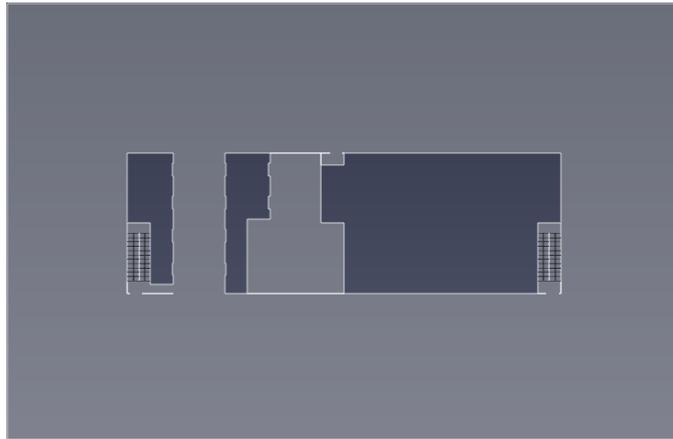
Schematic representation of a typical low-rise zone floor plan.
